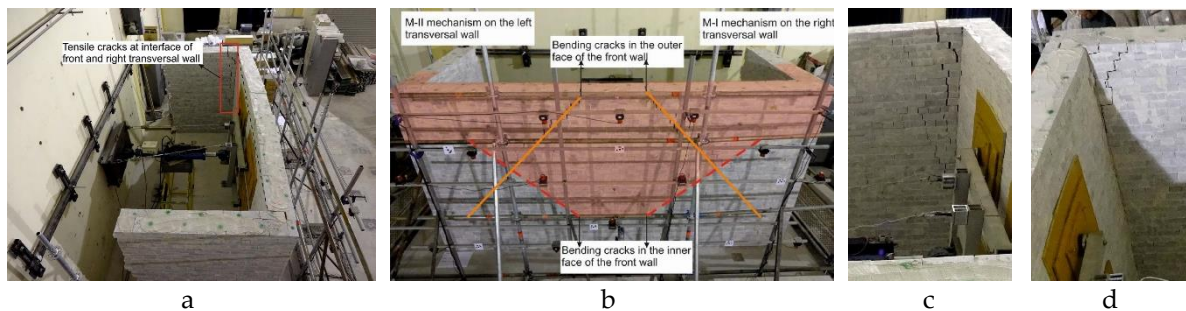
Observed damage – a) Deformation and damage at the connection, (b) the overturning mechanism, (c) and (d) close-up damage details of corners as detailed in [69]
